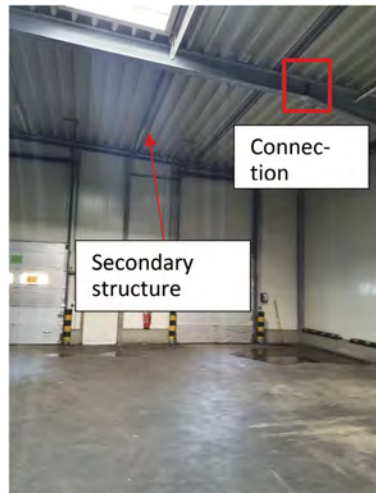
Between each of the arcs smaller steel beams as a secondary structure are visible. The connections are screwed. (right).
